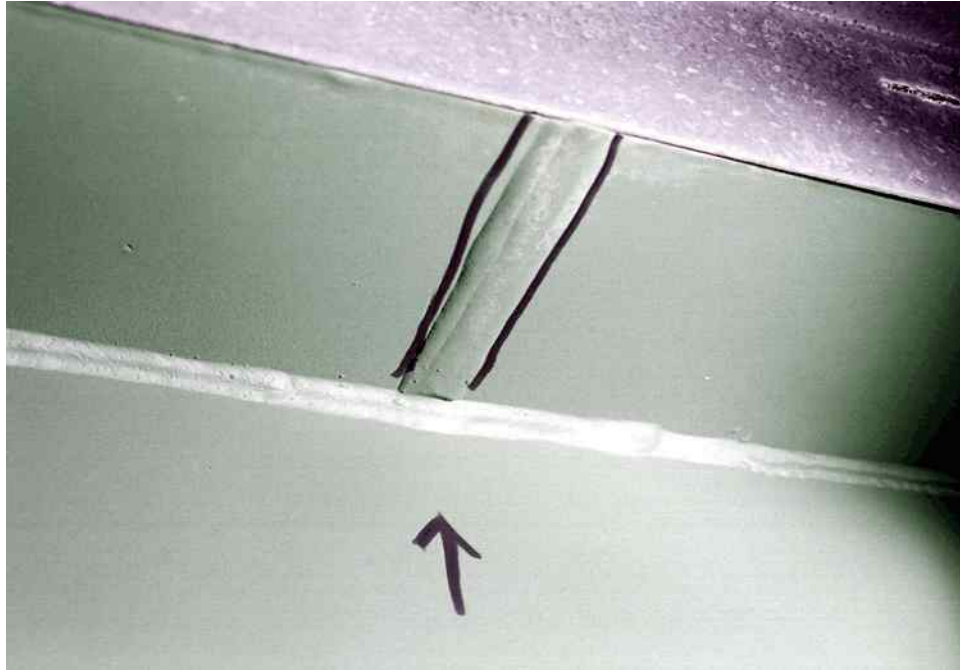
(71056-04) Top Flange Weld; Weld Crown Visible
